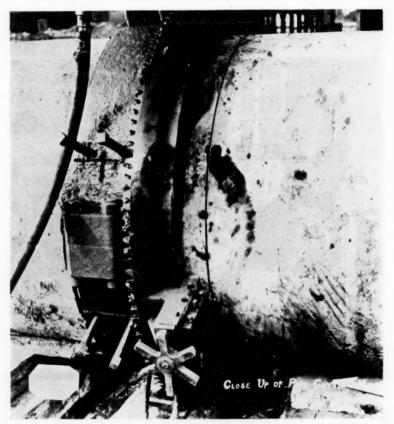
CLOSE-UP OF PIPE CUTTING MACHINE ON 36-INCH PIPE
